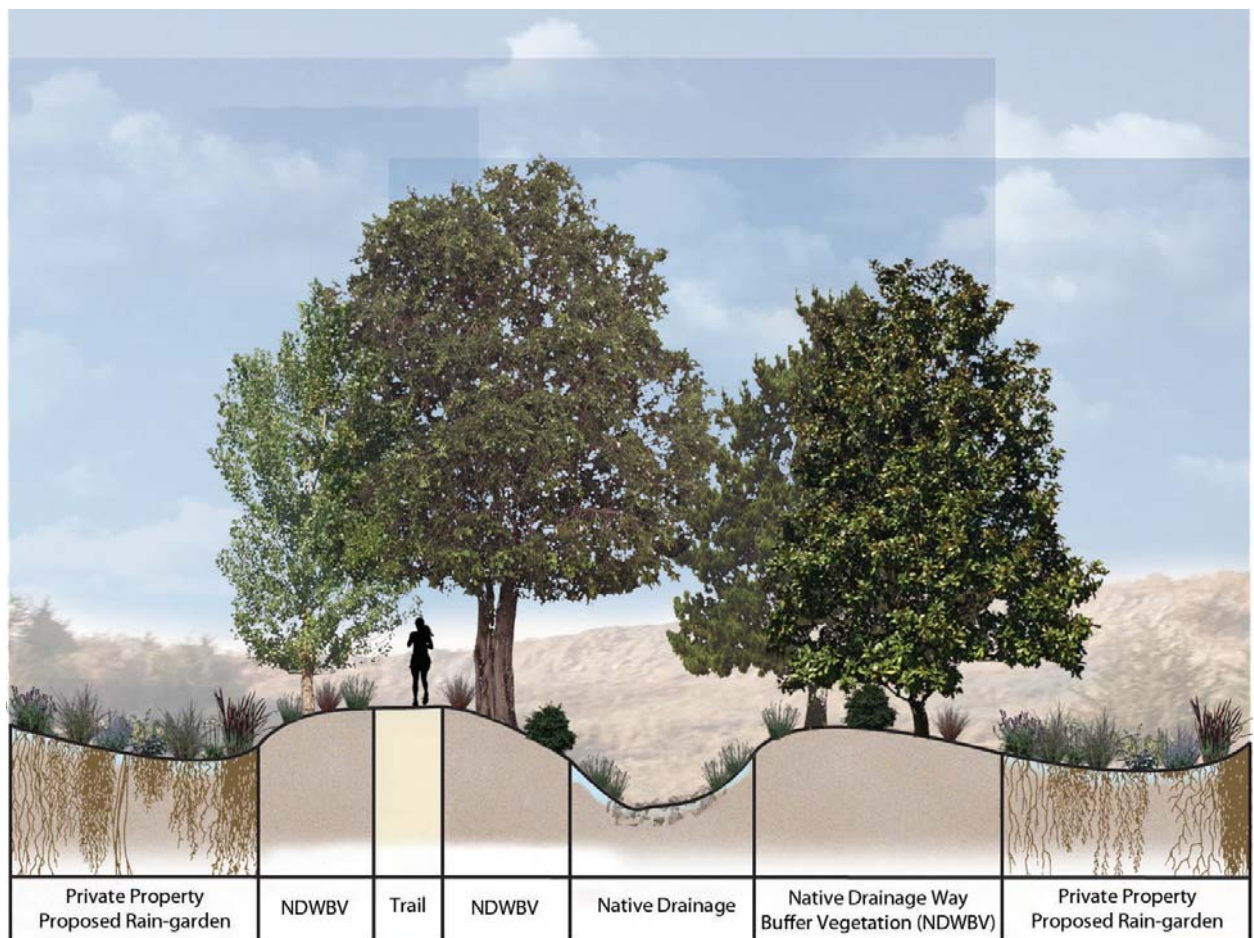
Section BB-Proposed Trails within Native Drainage Ways. By Author
